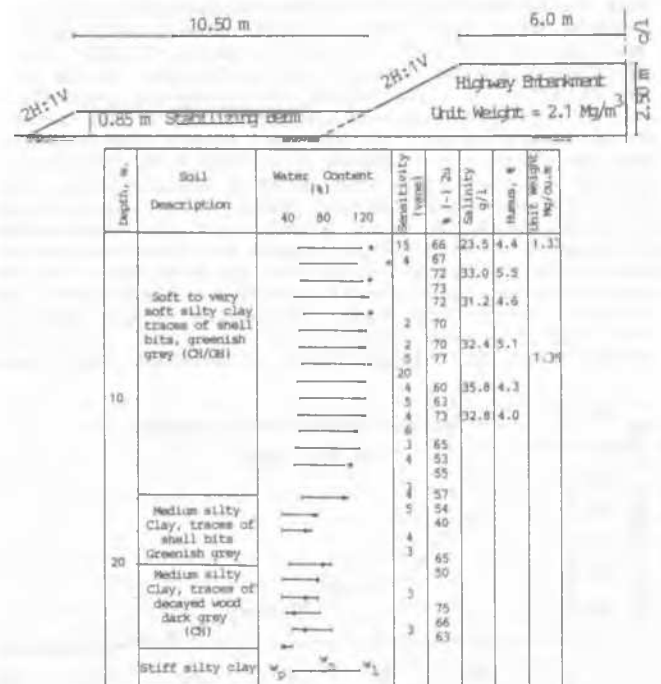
Typical embankment cross-section and soil profile at km 30 (after N.D. Lea et al, 1981)
